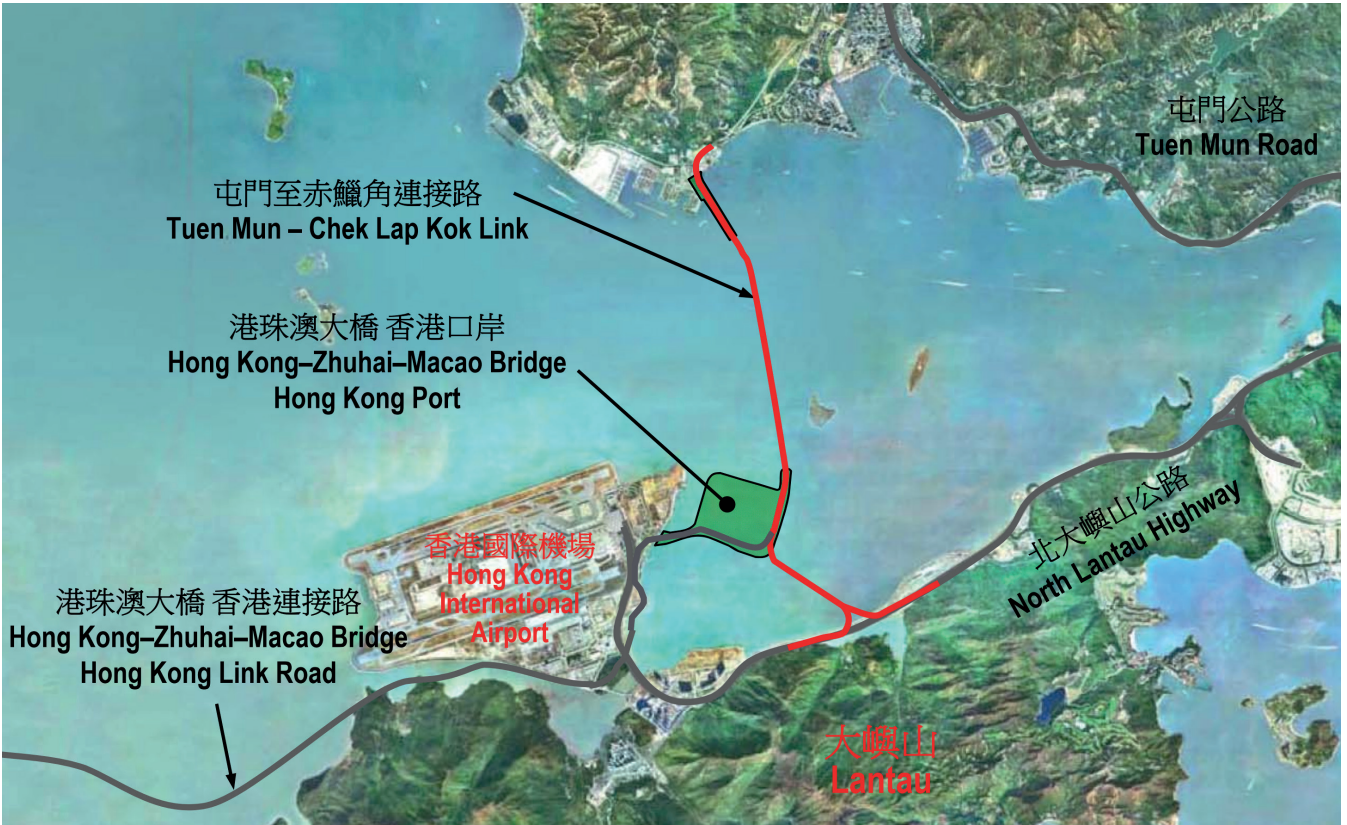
Tuen Mun – Chek Lap Kok Link project plan
